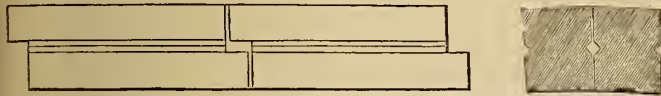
Details of Arch Bricks. Scale 1 1/2 inch to a foot.
